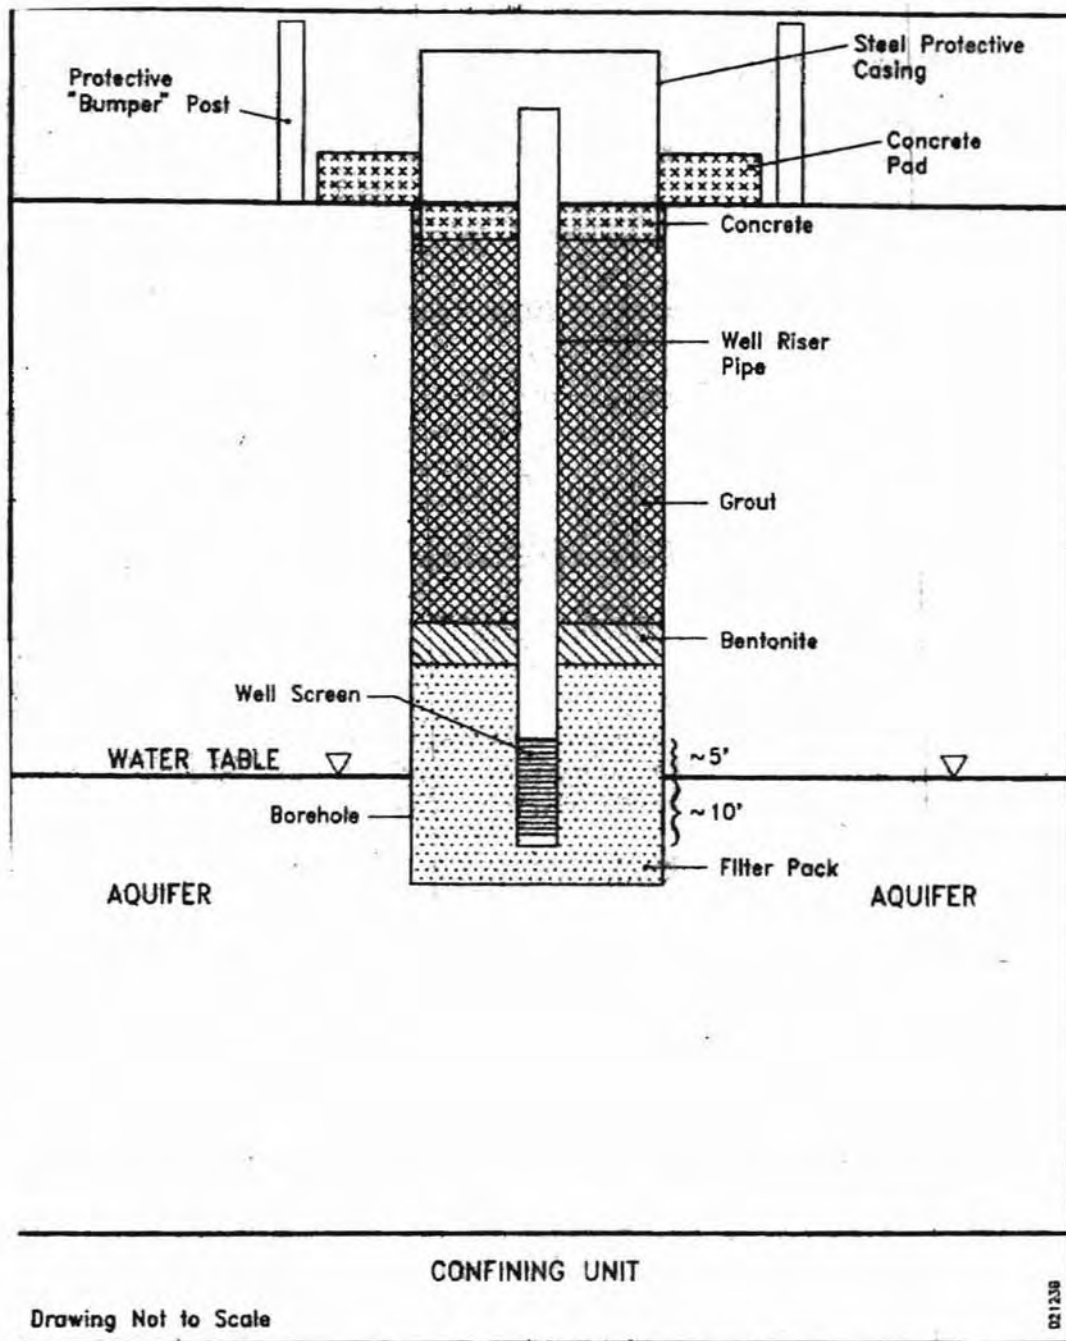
Typical Single Shallow Monitoring Well Construction
